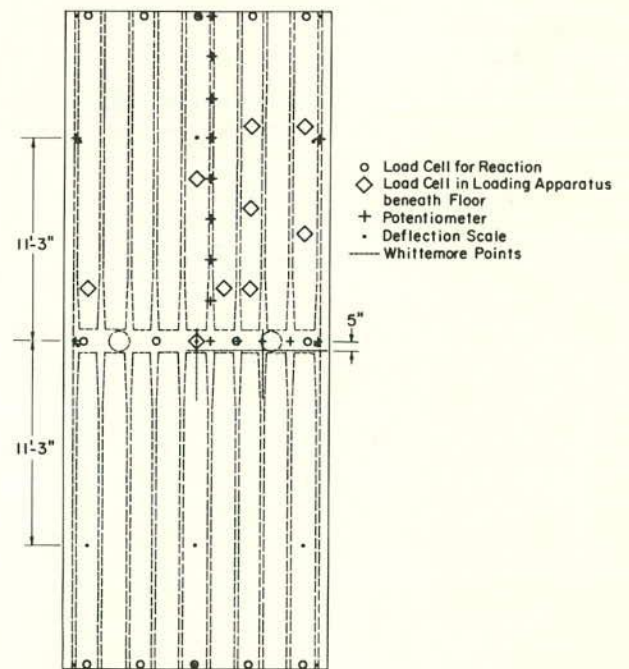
Instrumentation Layout for Double-Column Model Bridge
